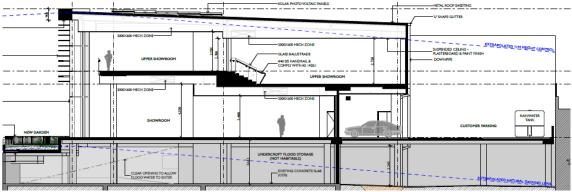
Diagram showing exceedance above 11m (source: Centric Architects)
